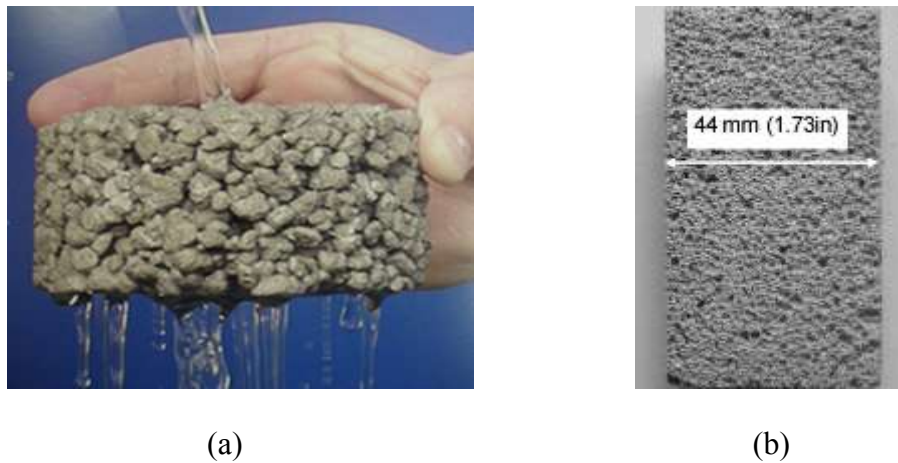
Lightweight concrete (a) No-fines concrete [21] (b) Cellular concrete [22]
